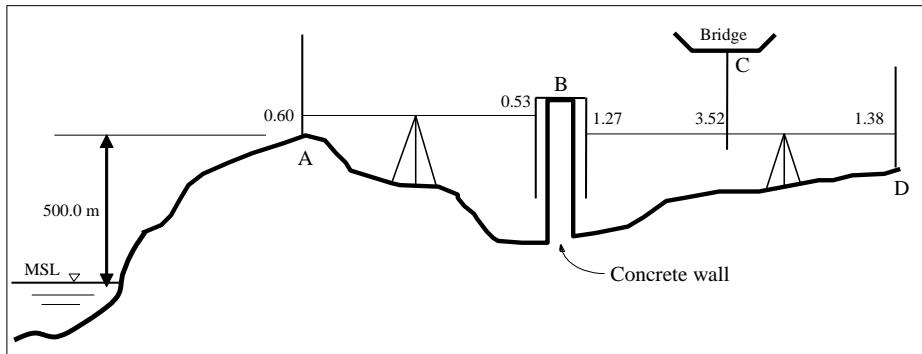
A leveling section with a bridge and a concrete wall obstacle.
